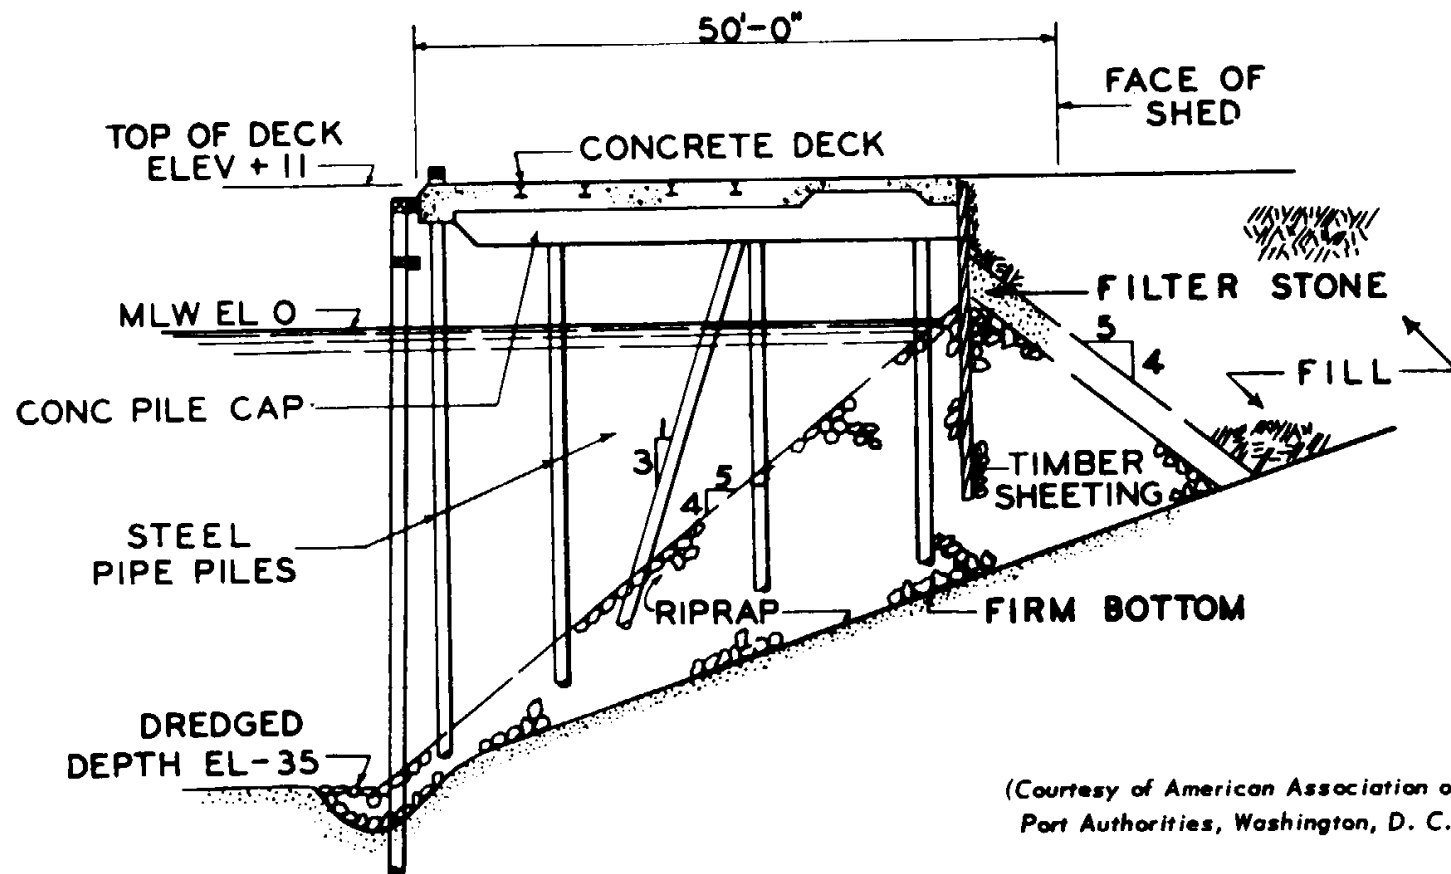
High-Level Open-Type Wharf Construction with Concrete Deck on Steel Pipe Piles.
